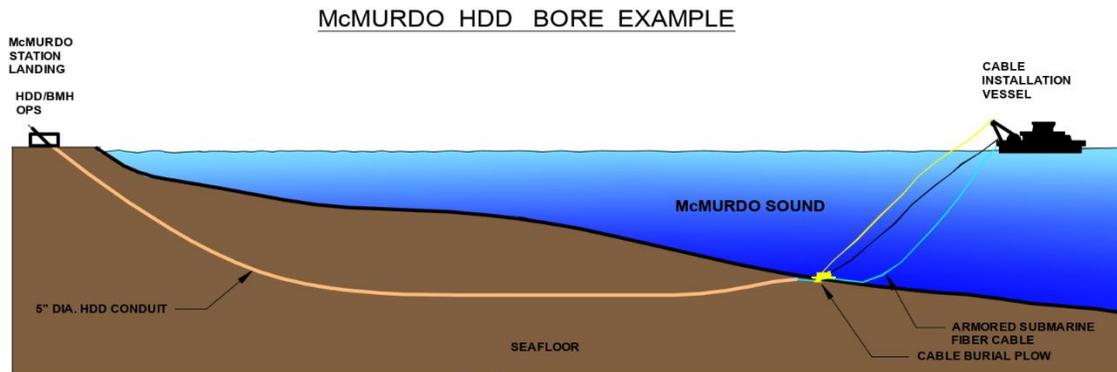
Example of horizontal directional drill bore and cable installation.
